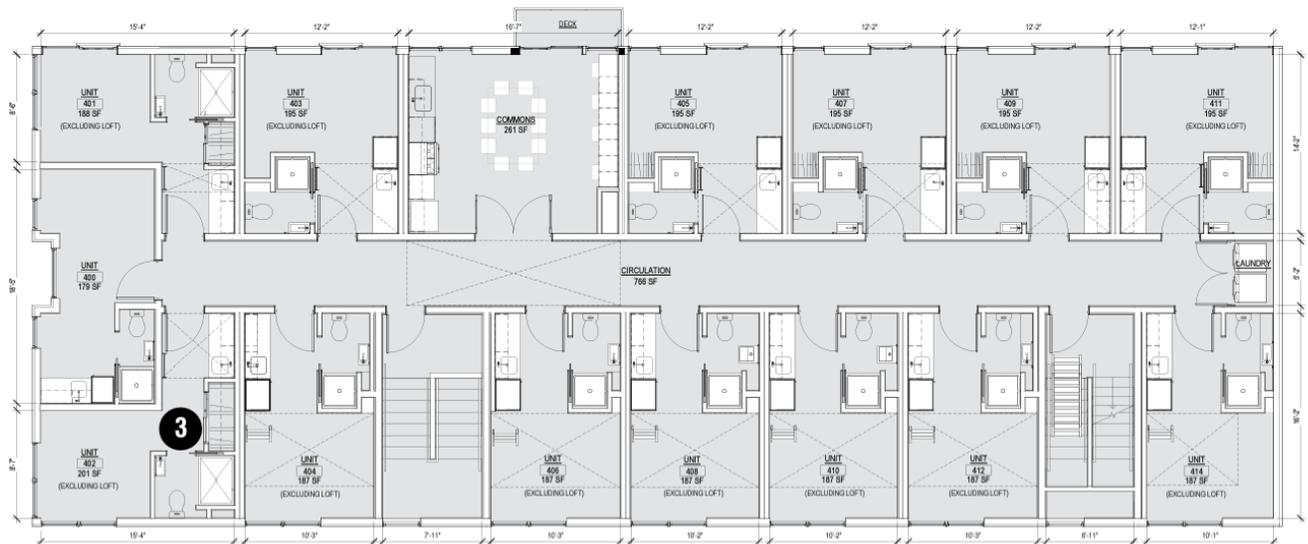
Karsti apartment building floor plan. Credit Neiman Taber Architects.
